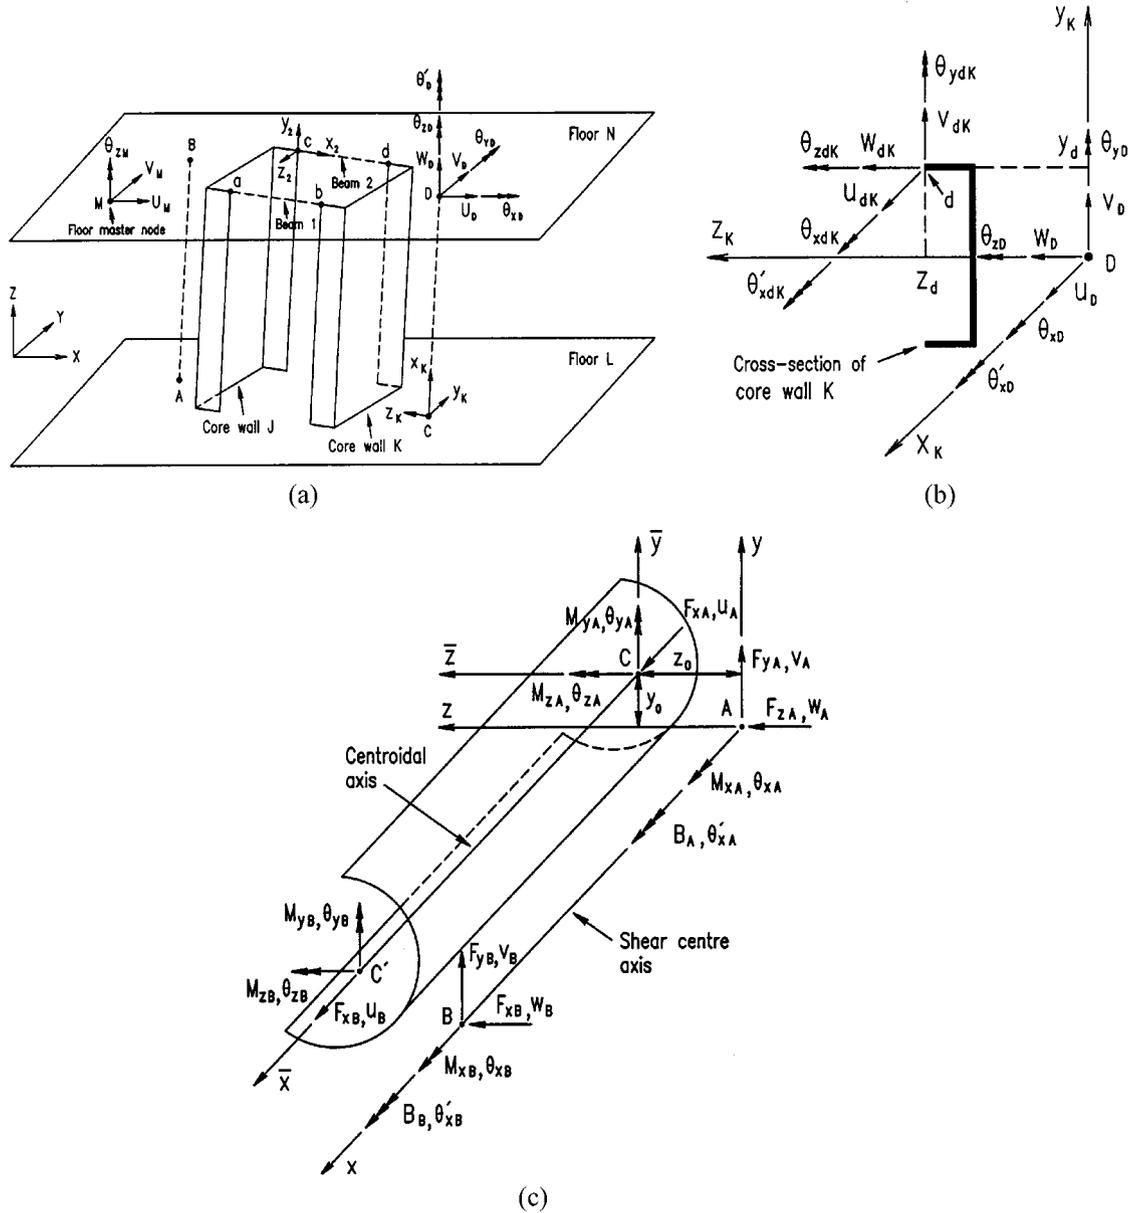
(a) A building core wall between two floors, (b) Deformations of a thin-walled cross section, (c) A generic model for a thin-walled beam-column member
